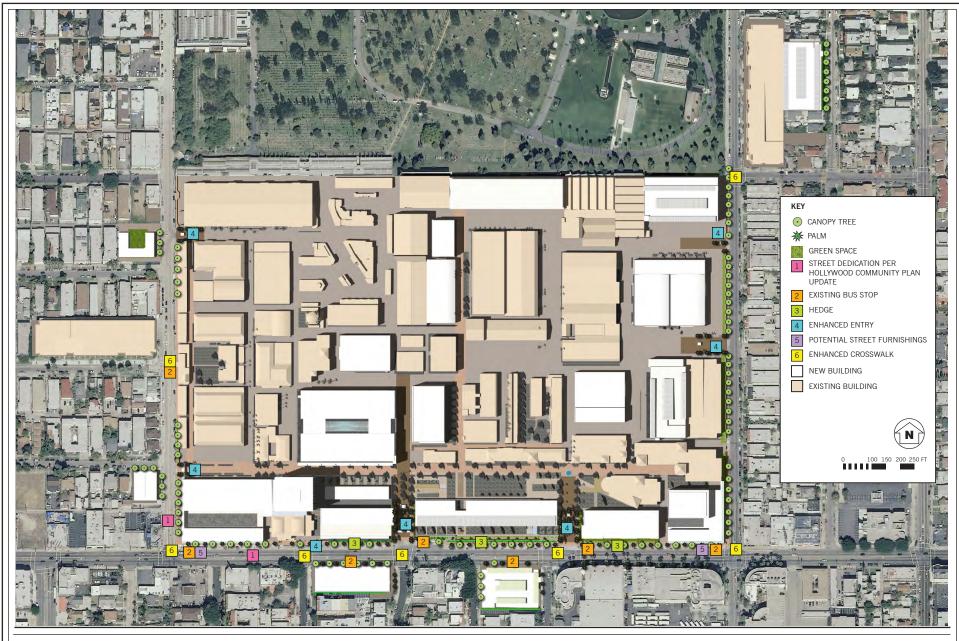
Conceptual Streetscape Plan coordinated with street lighting and informational signage to unify the public realm. Street trees and perimeter landscaping also would be installed along the Main Lot's Gower Street and Van Ness Avenue frontages where it would not to impede sidewalk use.
